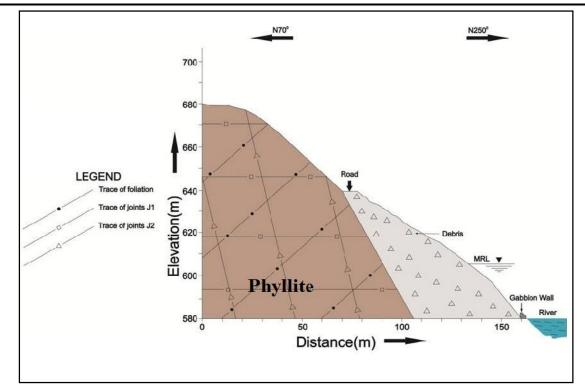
Geological Section of Slope LBS2 Located 900 m d/s of Zero Bridge (opposite of Marh Stream)
